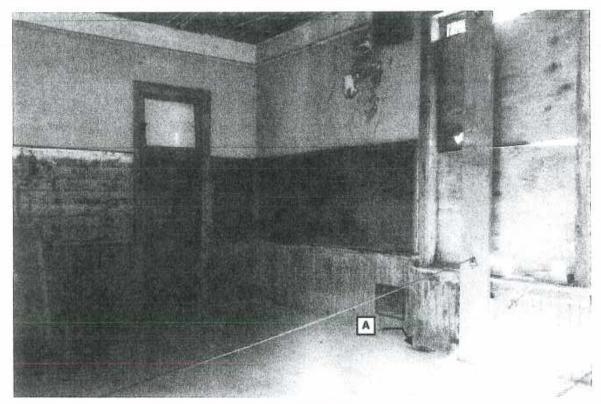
Room 15 view northeast. (A) Irregular-shaped hole in floor.
